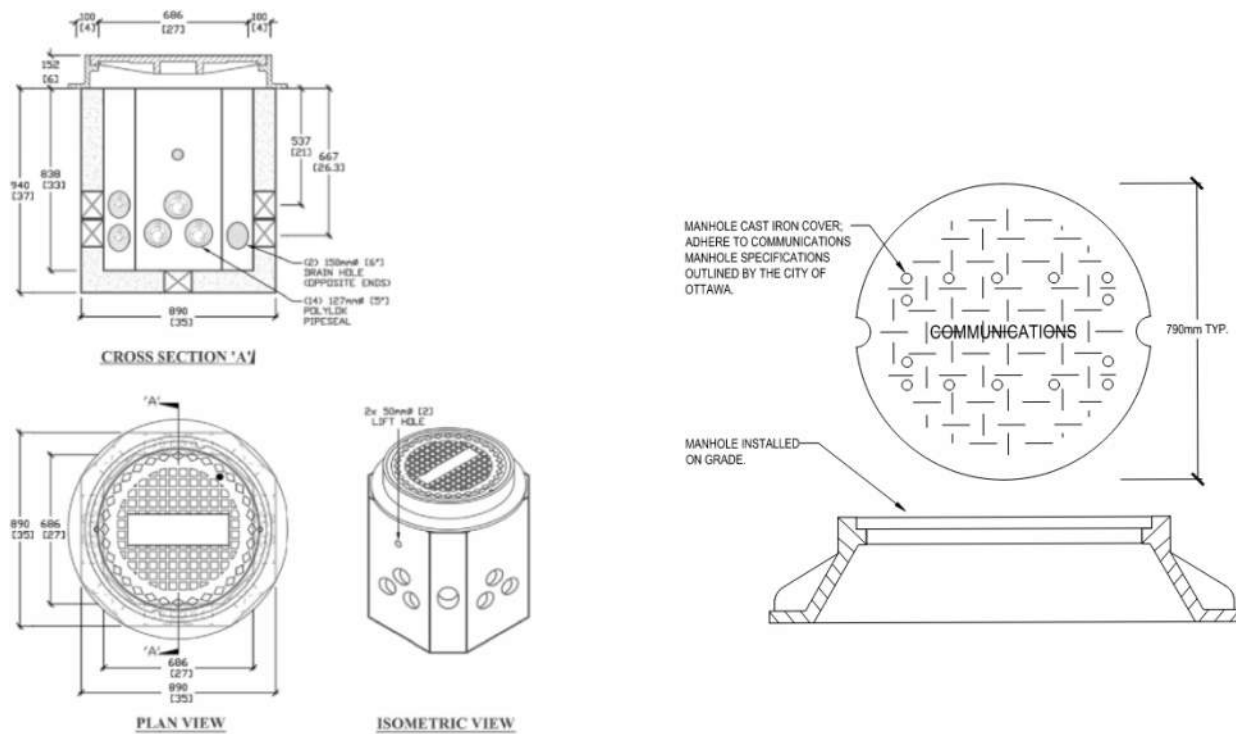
Typical Manhole & Handhole Detail (Attain Drawing Page #9)
